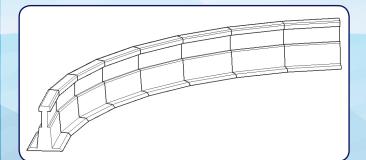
Apart from the standard 3.8m Type F barrier, other type of temporary safety barriers are available in shorter span and angled sections which are suitable to cater to corners and road bends such as modular steel barriers
